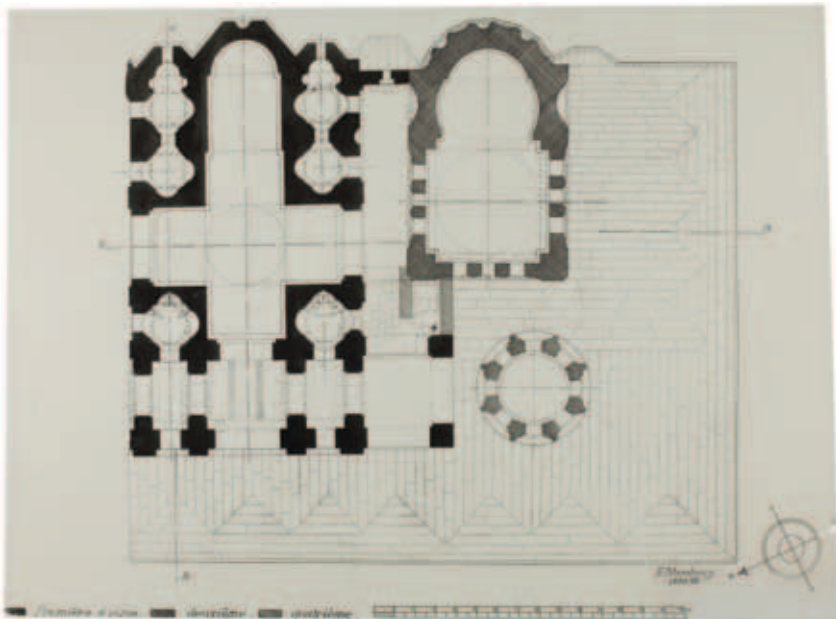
Monastery tou Libos, roof plan (after Mamboury) © Dumbarton Oaks, Image Collections and Fieldwork Archives, Washington, D.C.
